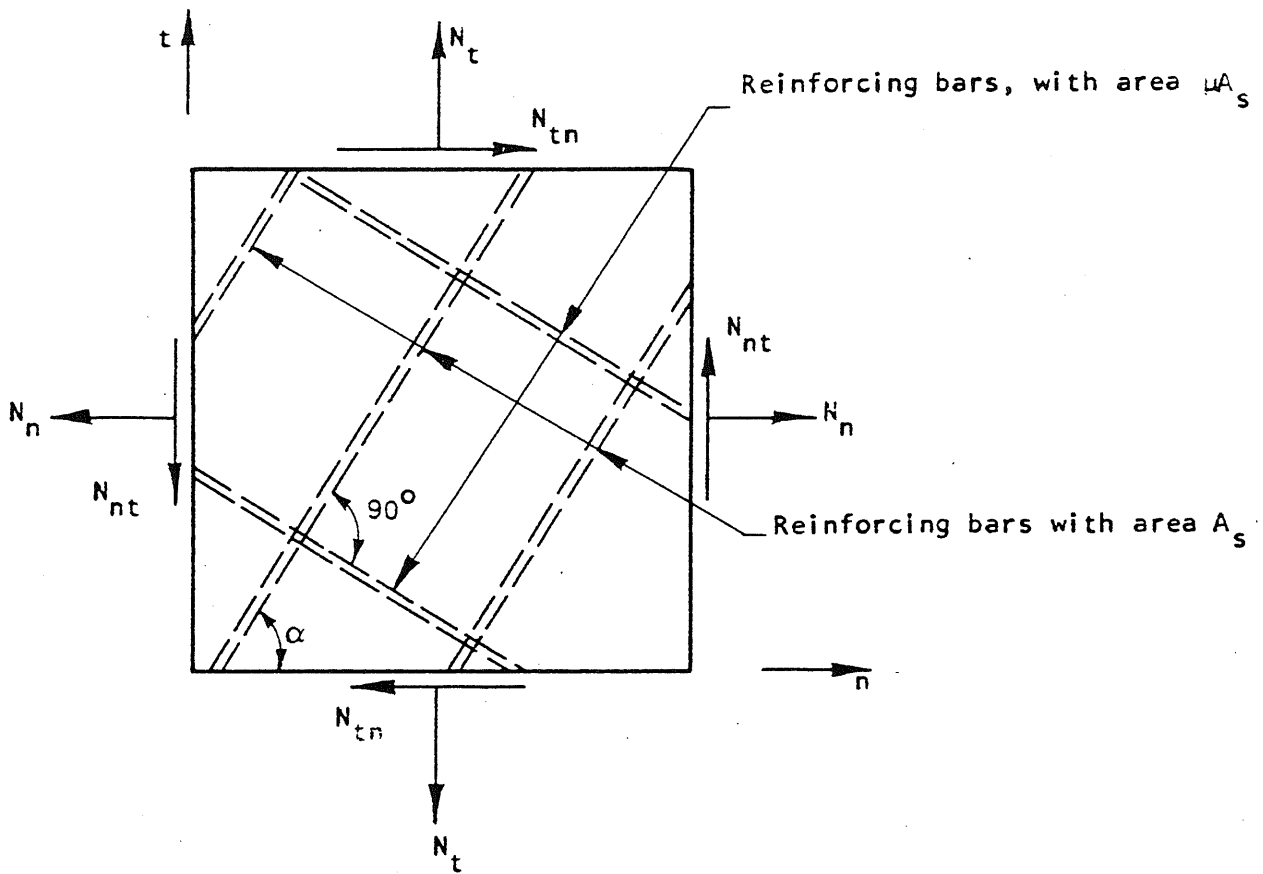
REINFORCEMENT IN A UNIT ELEMENT OF A REINFORCED CONCRETE PLATE
